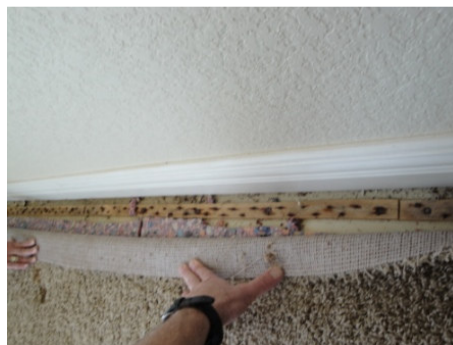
Evidence of moisture on carpet tack board (rusting nails) and peeling paint that was on the slab.
